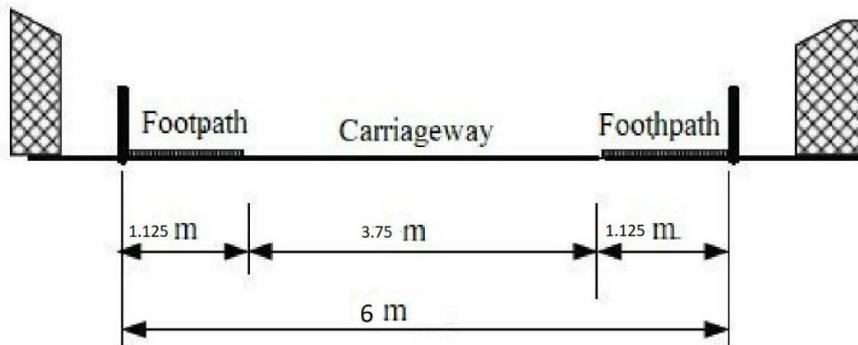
Typical Cross-section for Class D Roads (with RoW 6 m)
